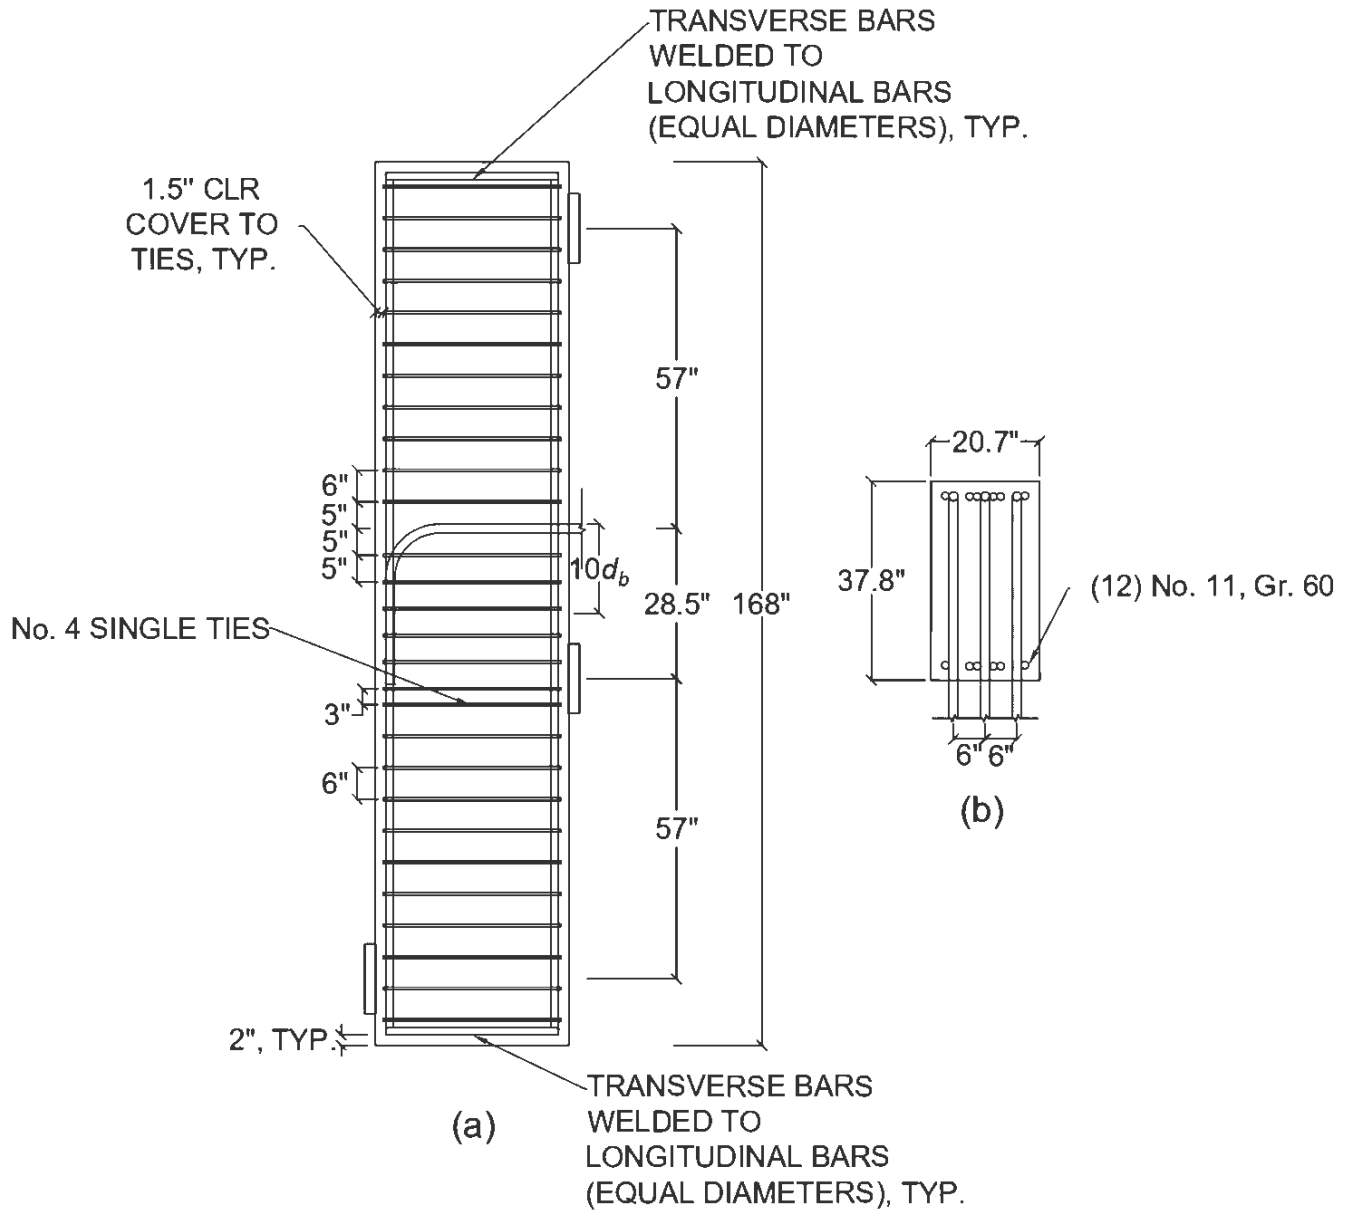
Details of reinforcement layout for No. 14 hooked bar specimen H14-8: (a) elevation, (b) cross-section
